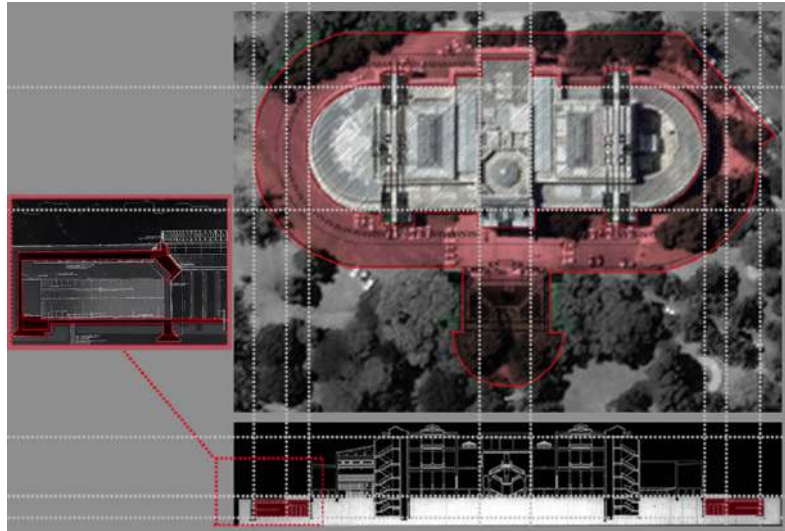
Exploded axonometric view; the enlargement project is in red.
